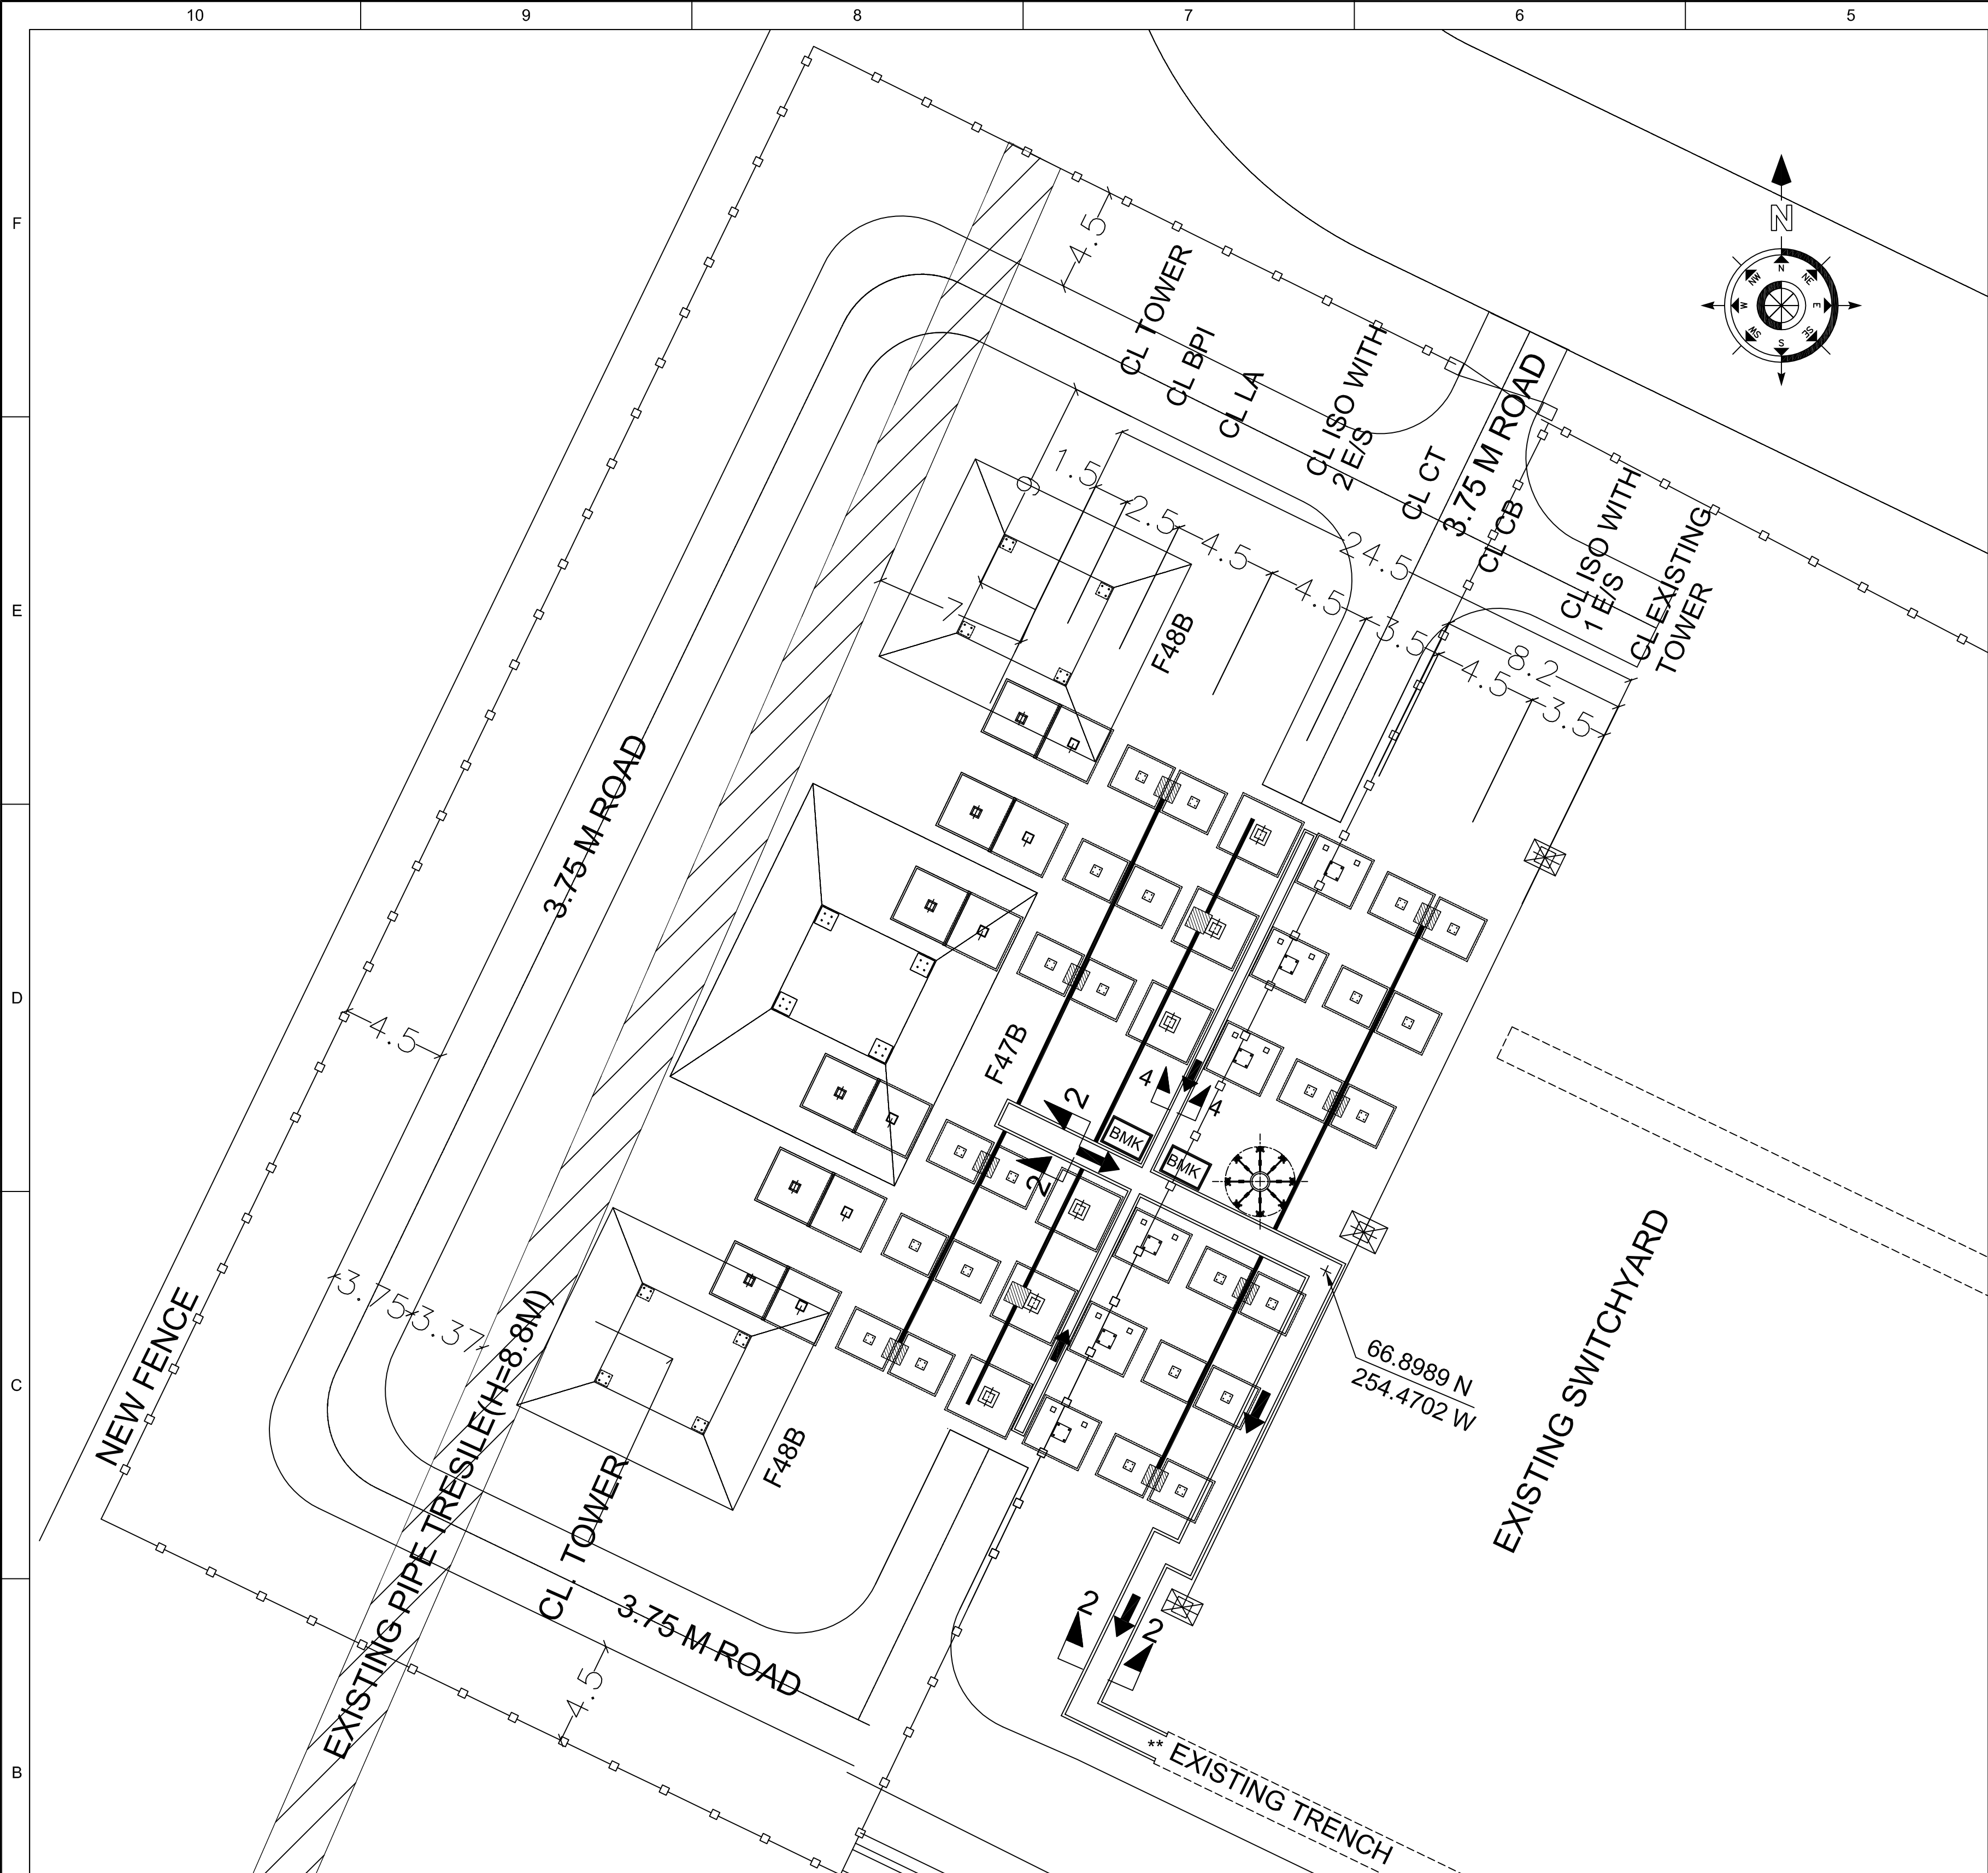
DETAILS OF G.I. PIPE / TRENCH FOR EQUIPMENTS :-
